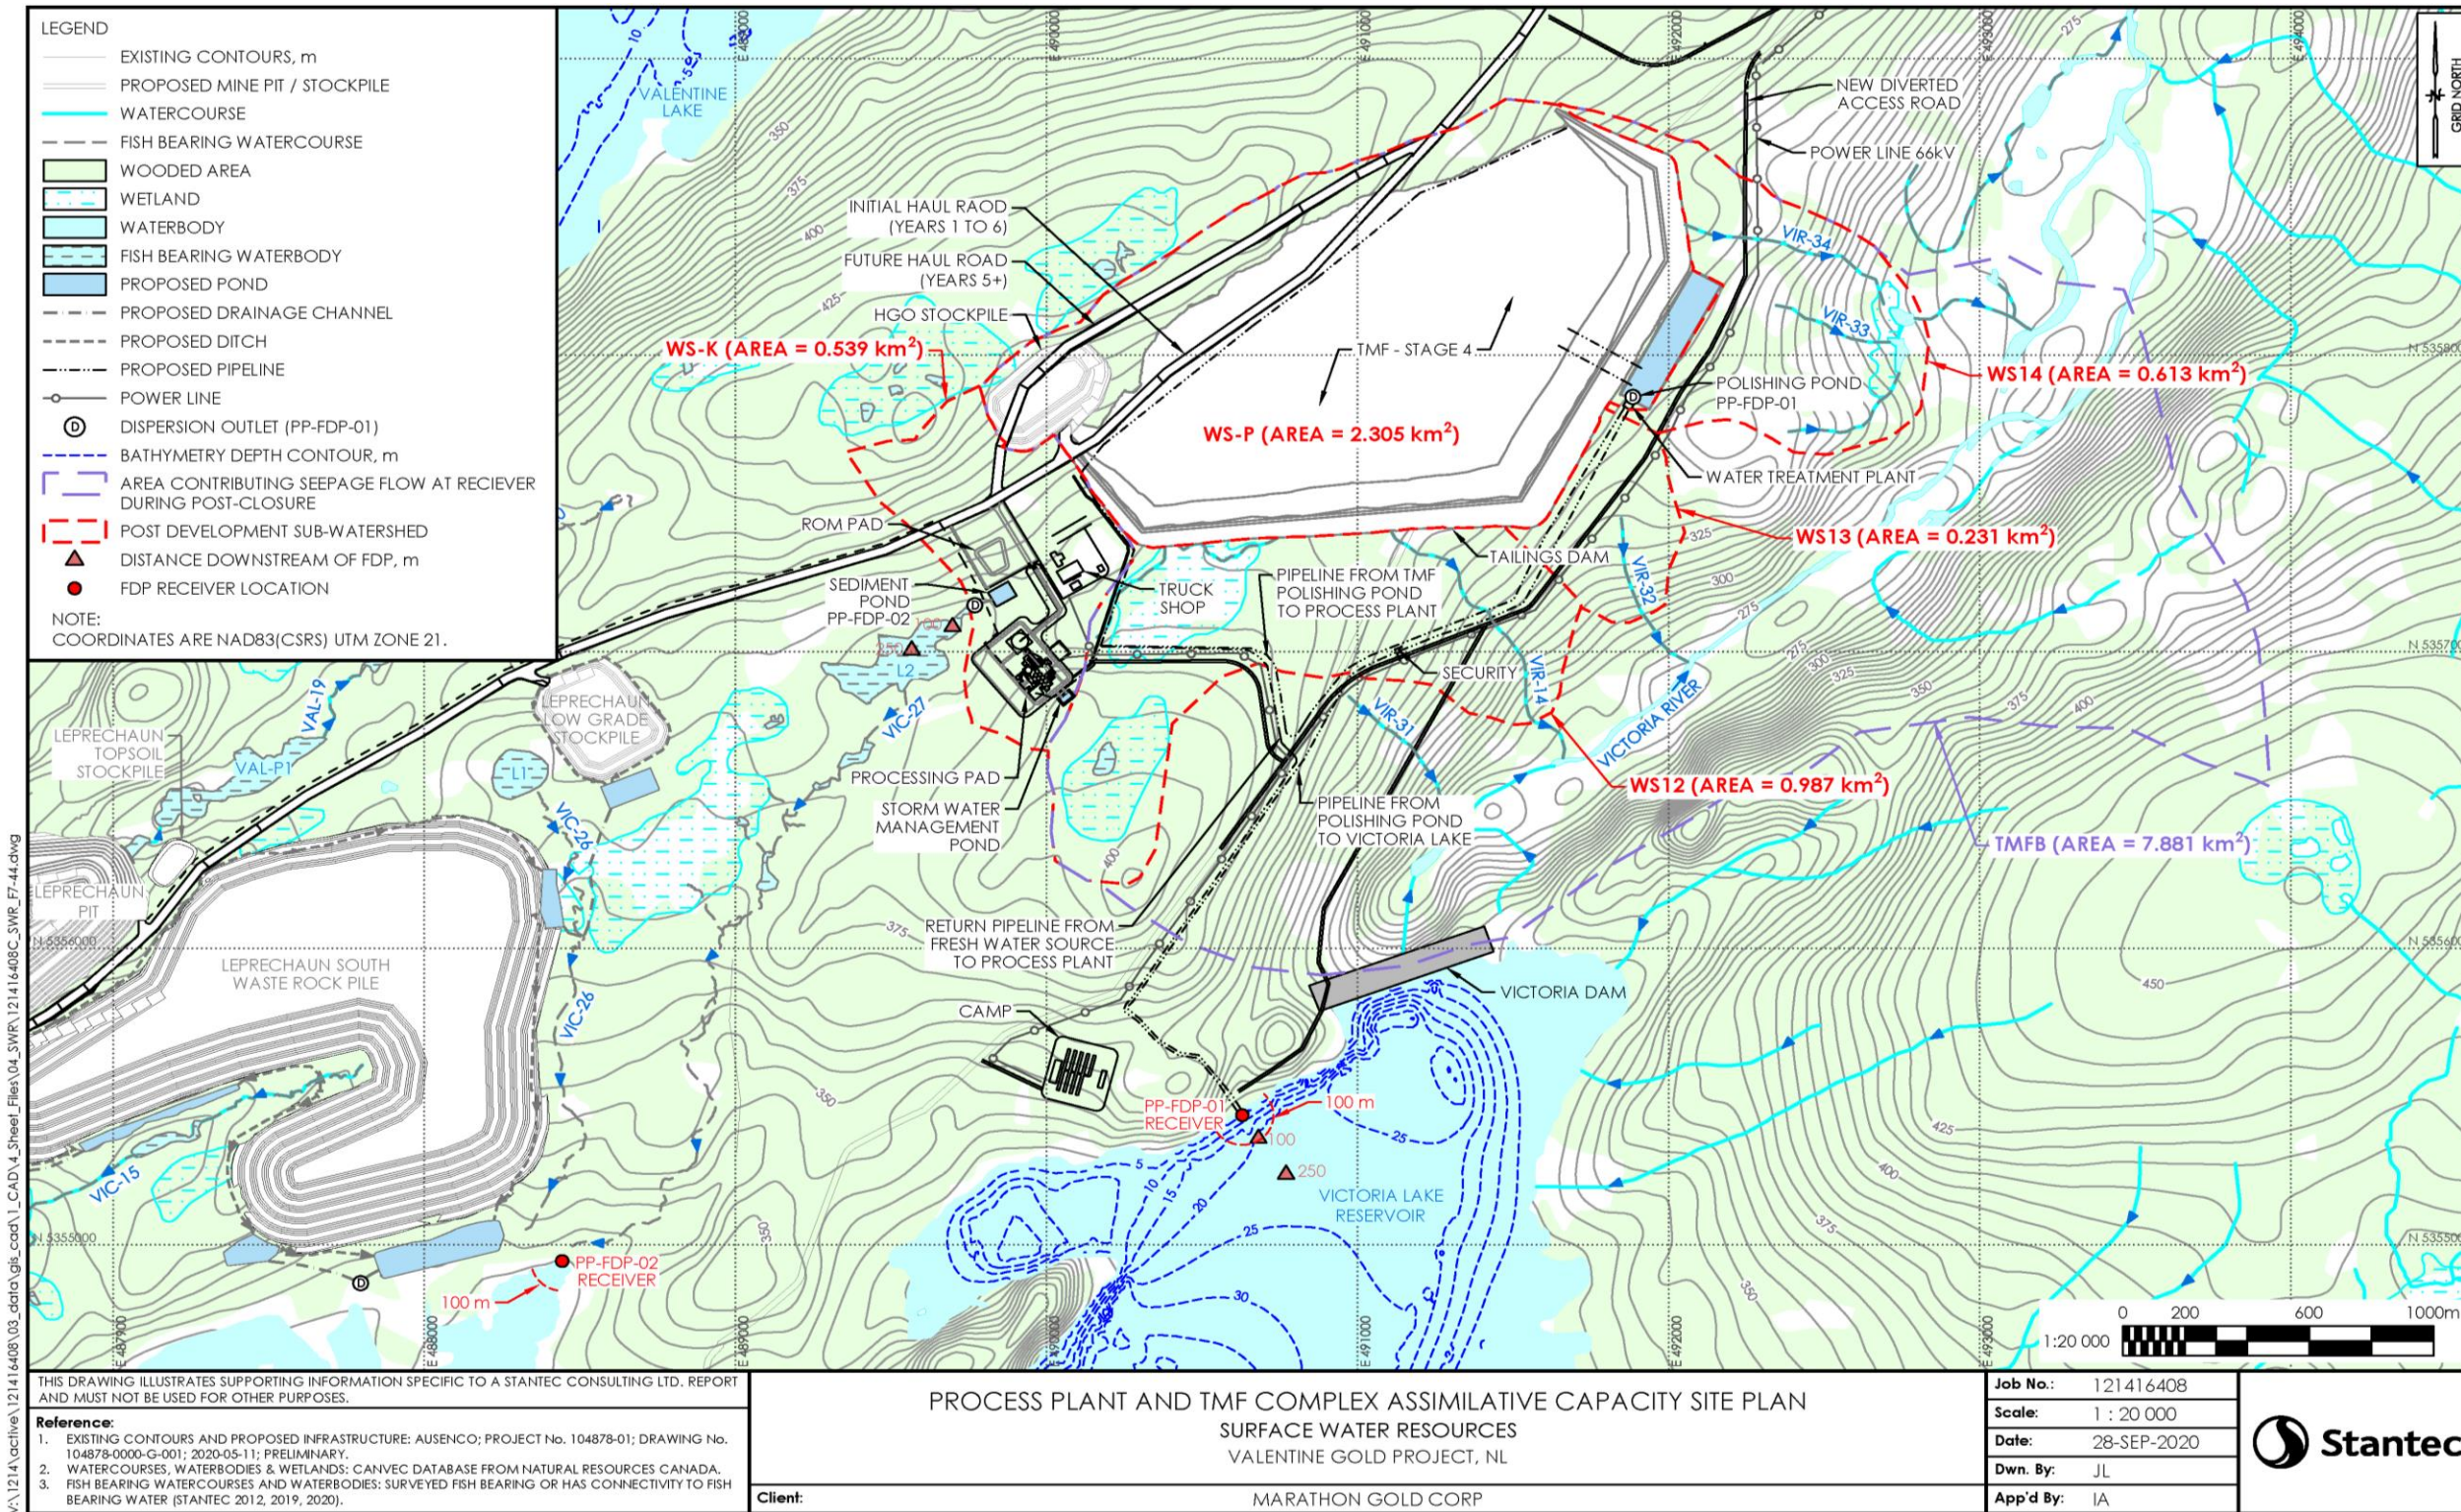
Process Plant and TMF Complex Assimilative Capacity Site Plan
